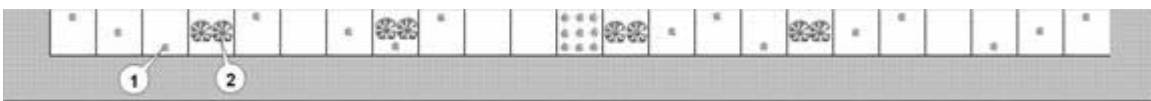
side view of dairy barn A. 1. Impeller anemometer. 2. Huge side fans.
